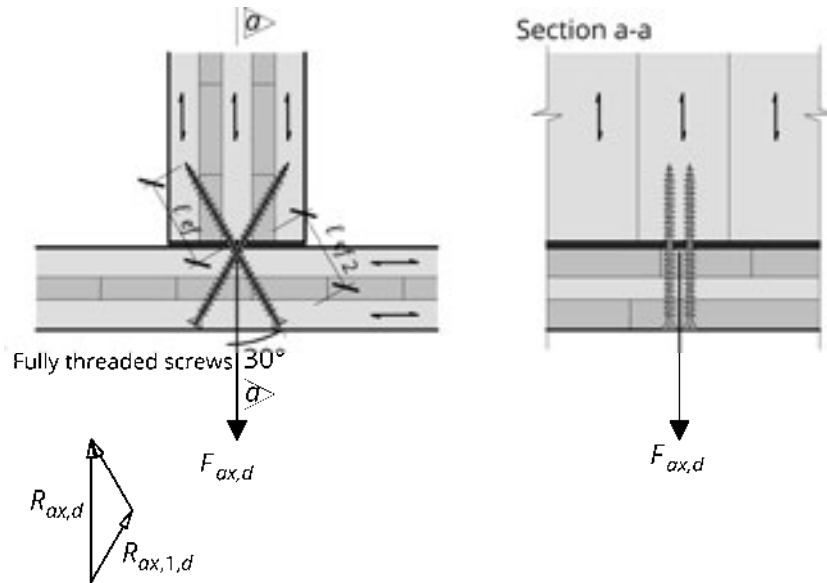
Suspension using fully threaded screws inclined out of the wall plane
